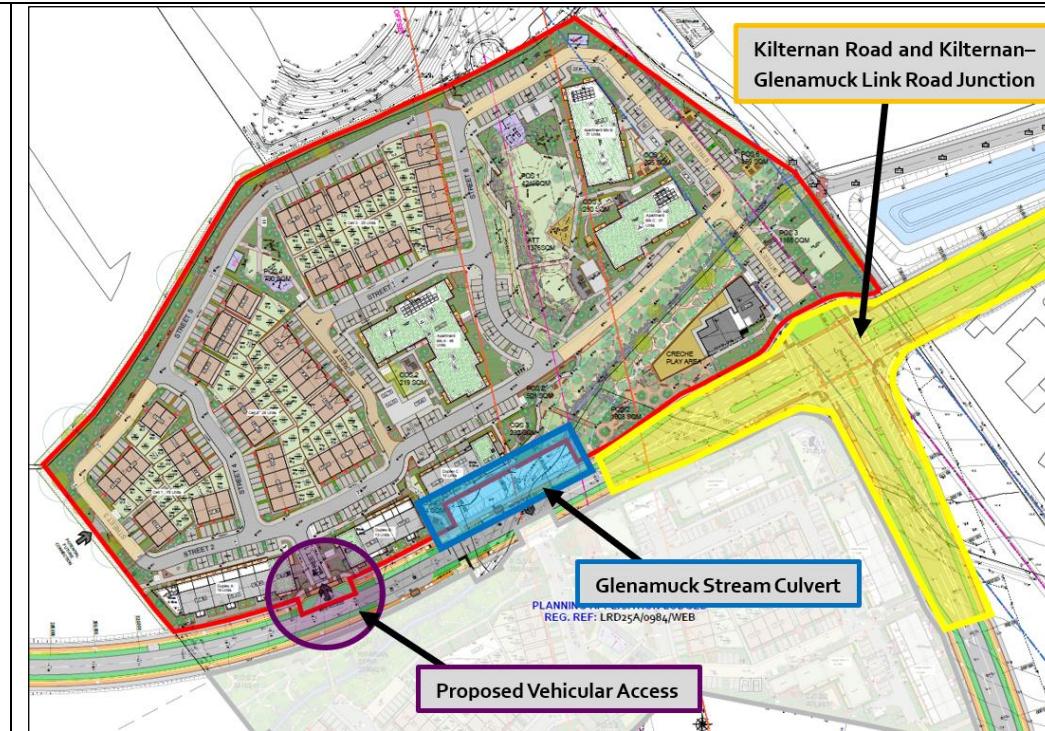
Proposed Site Layout Plan (Outlined in Red) with the Vehicular Access Restrictions and the Proposed Vehicular Access to the Site Identified
